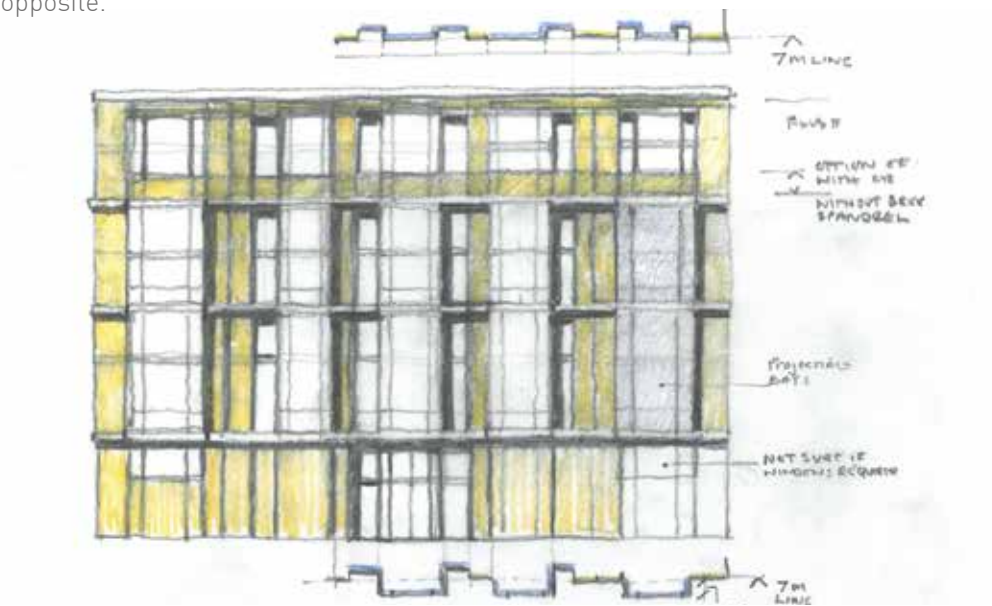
86 Concept sketch for the Courtfield Road elevation
